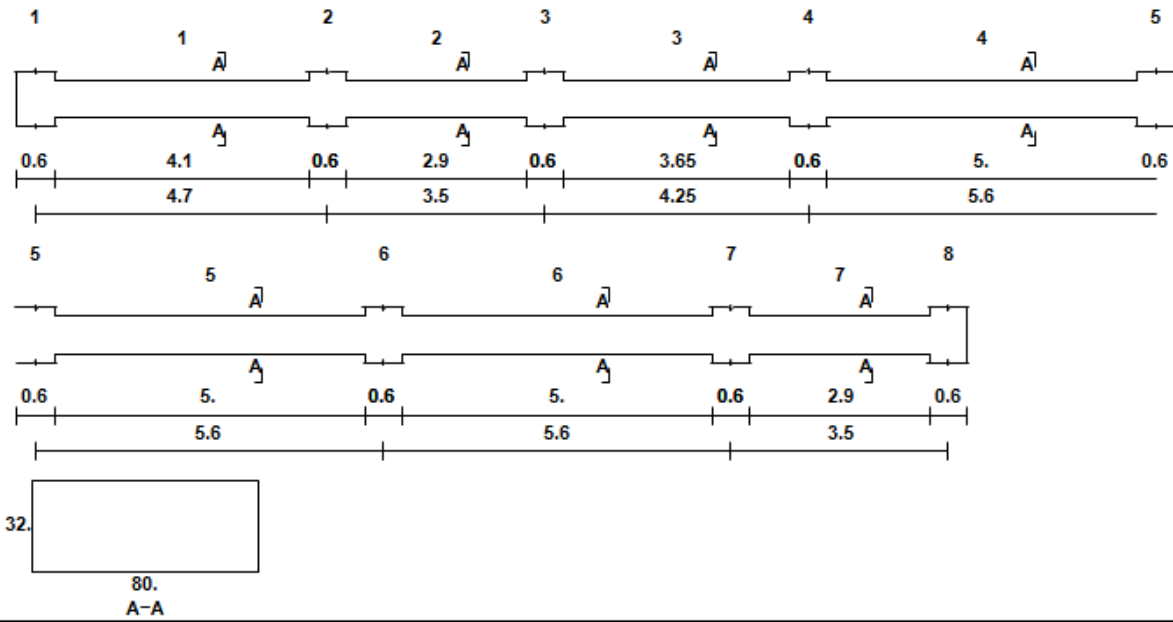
beam 2 for plan basement 1(BB1-2).
